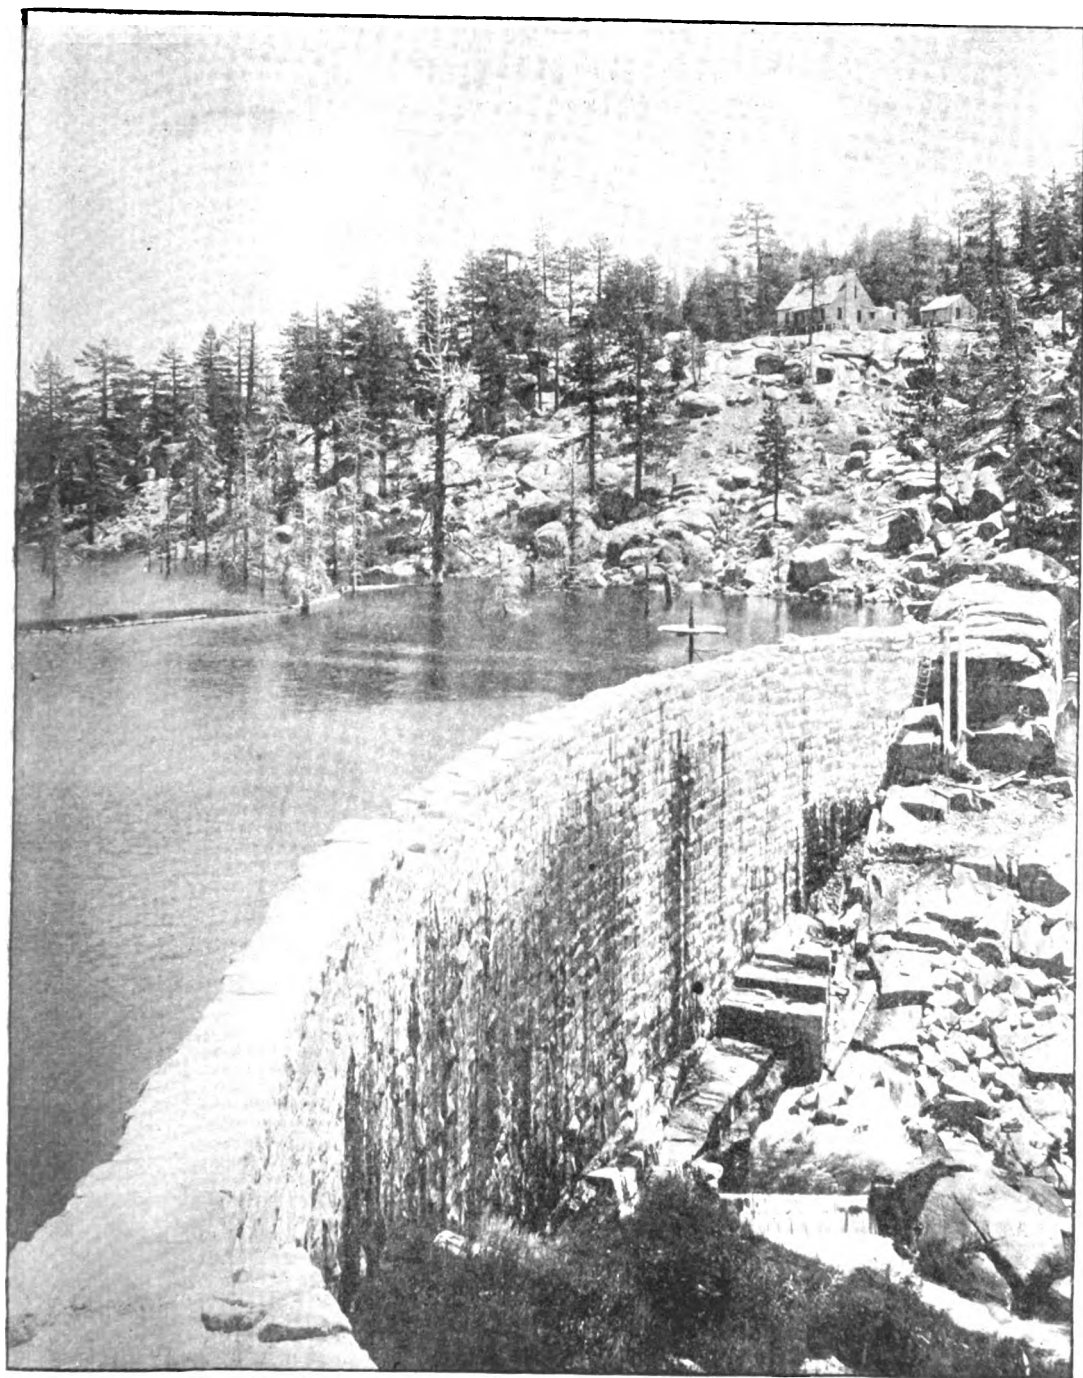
BEAR VALLEY DAM, LOOKING SOUTH, TOWARD SPILLWAY.
